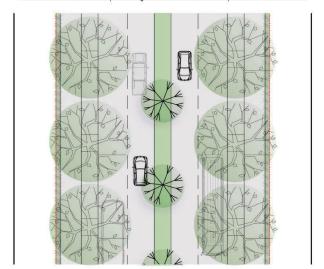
Carrington Road (from Showground Road to Middleton Avenue)
